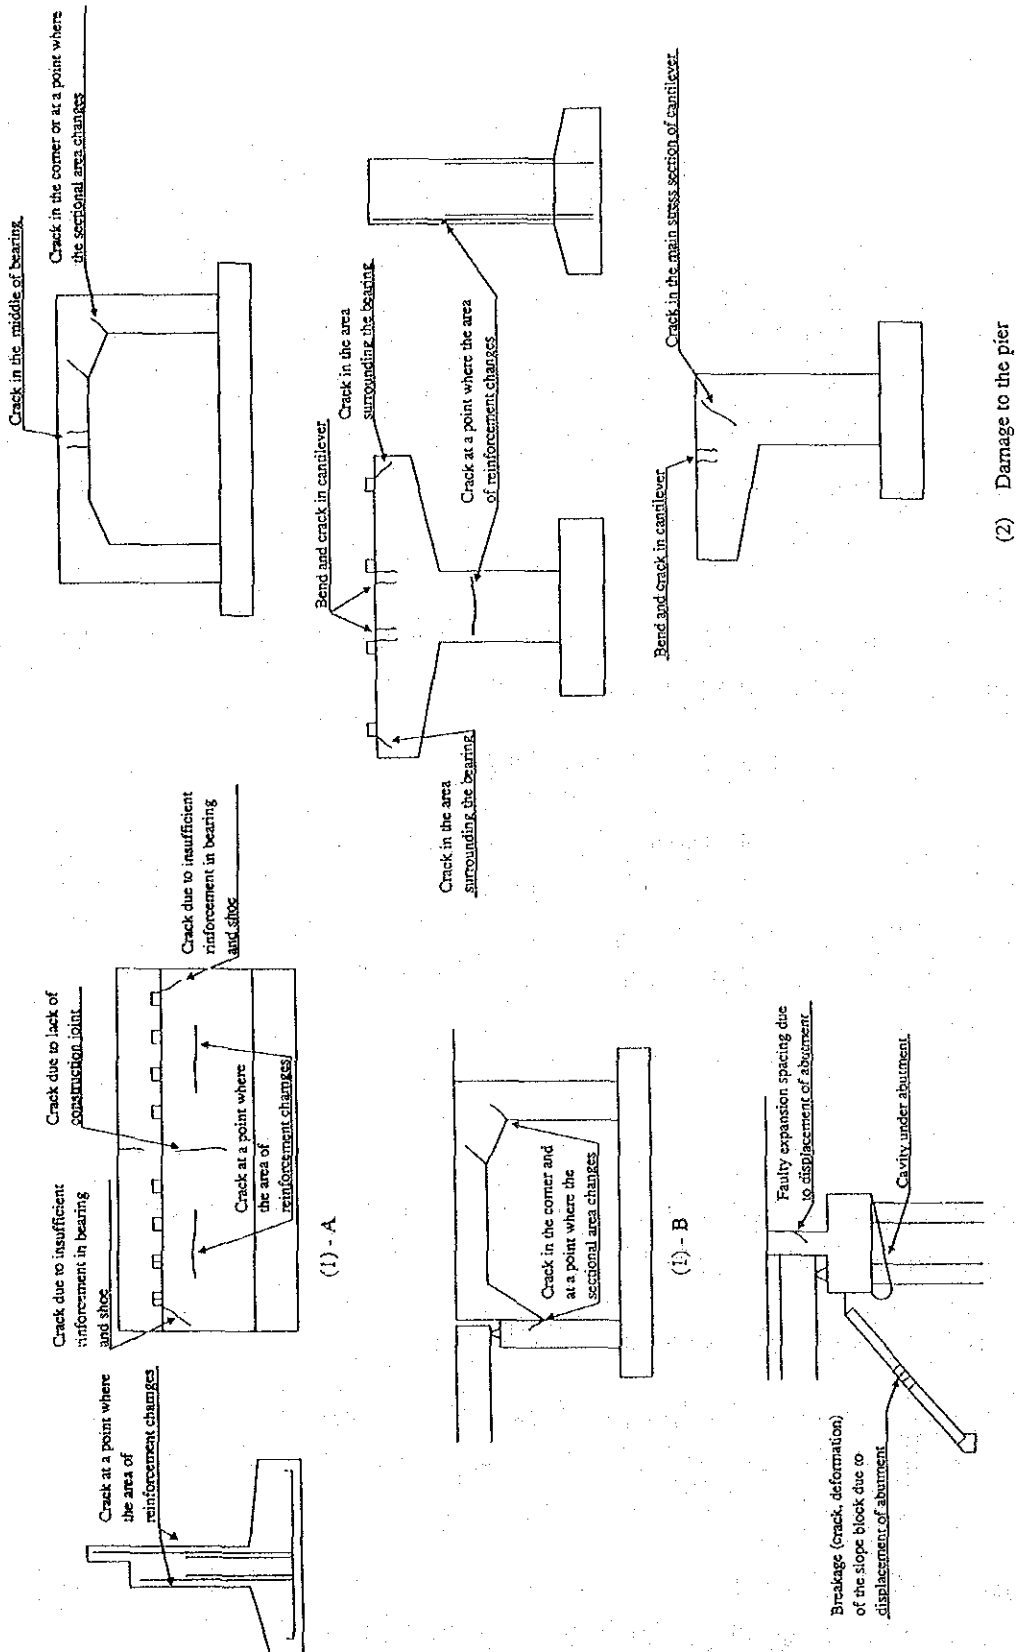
Damage Examples for Concrete Structure (Substructure)
